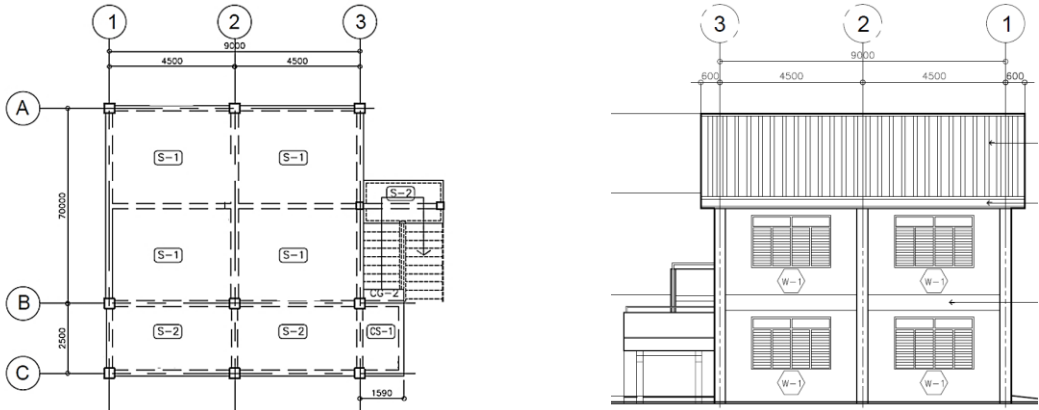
Plan (left) and elevation (right) view of the 2-storey, 2-classroom school (DepEd, 2012)
